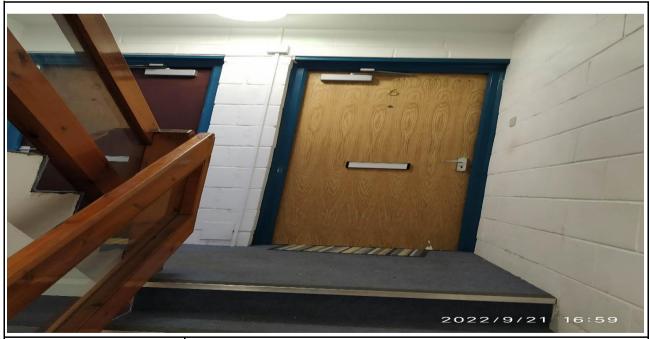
Note: New Fire Door Fitted to FD30 Spec.
